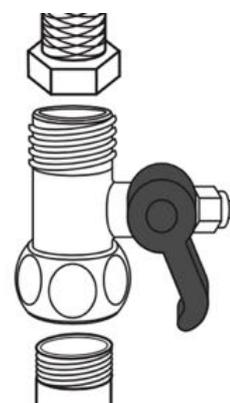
An example of mounting a t-bend with a ball valve into a gap in the water supply line.
